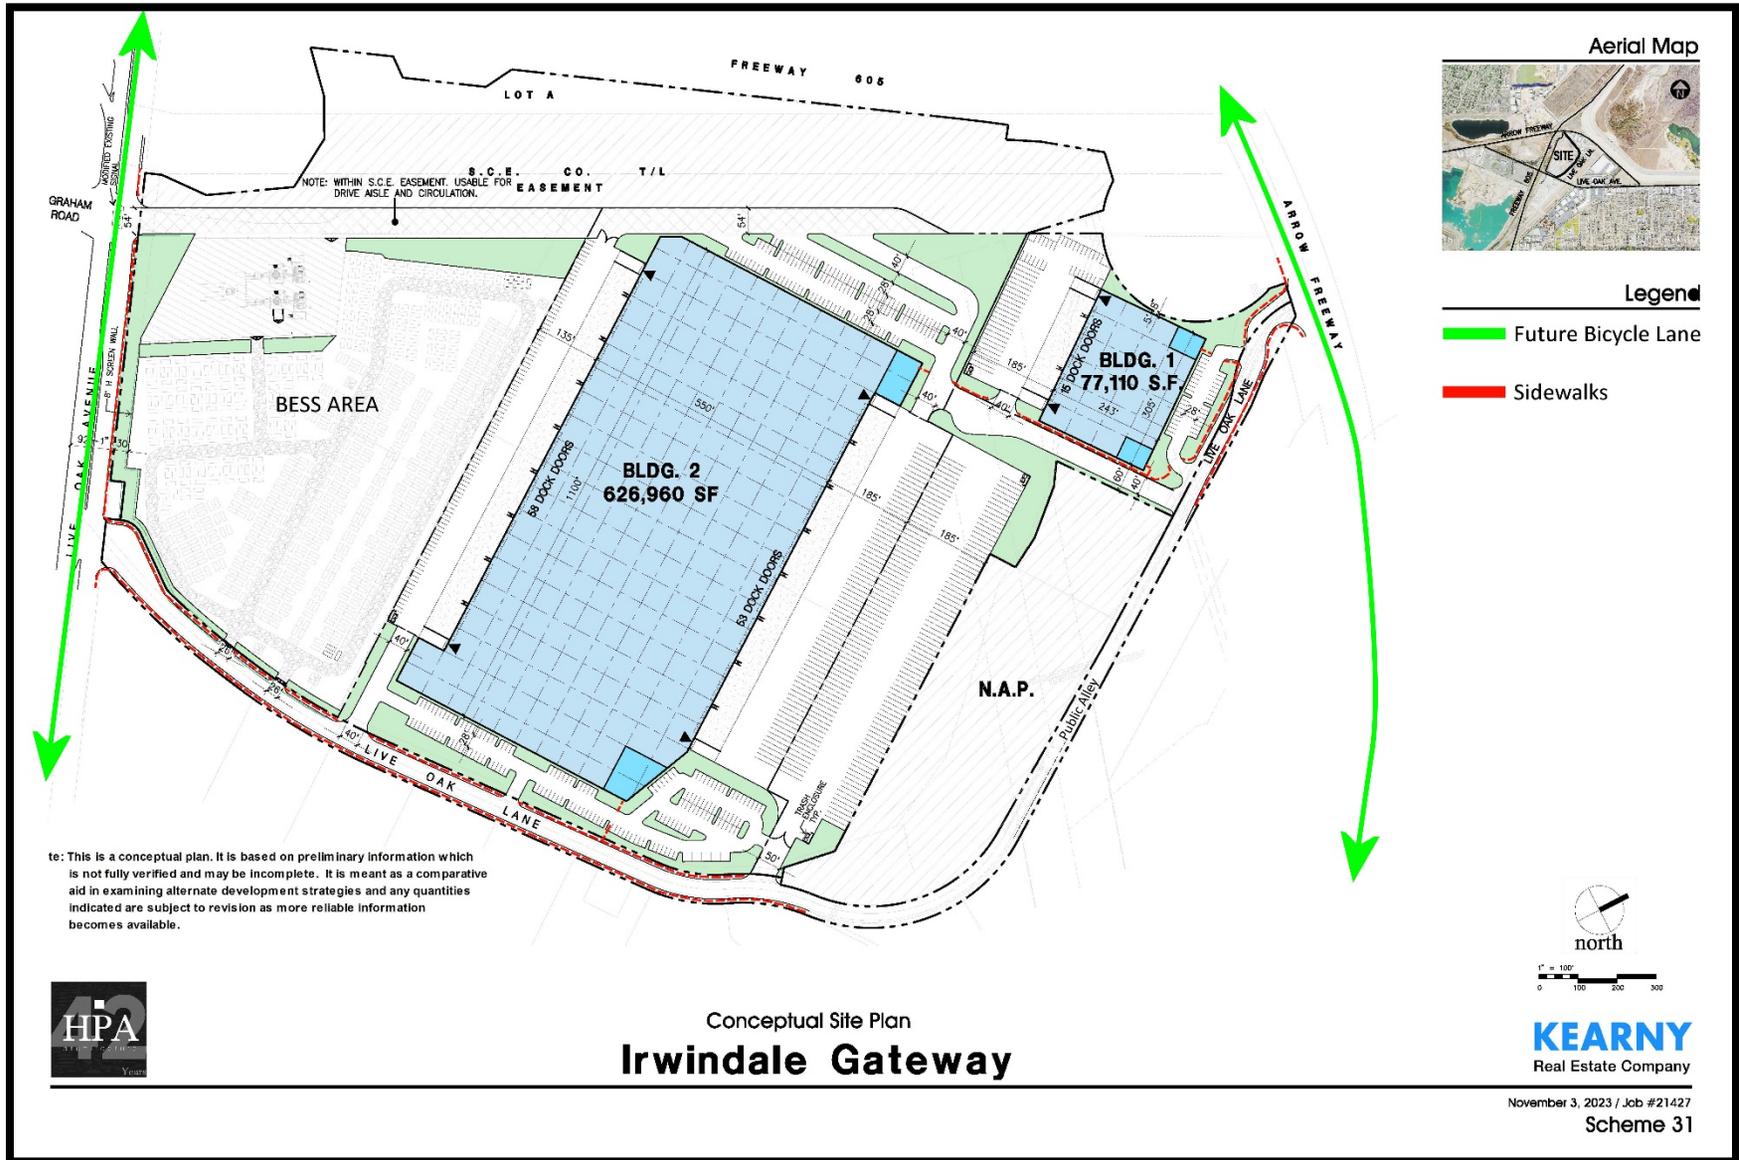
CONCEPTUAL NONVEHICULAR ACCESS PLAN WITH BESS
